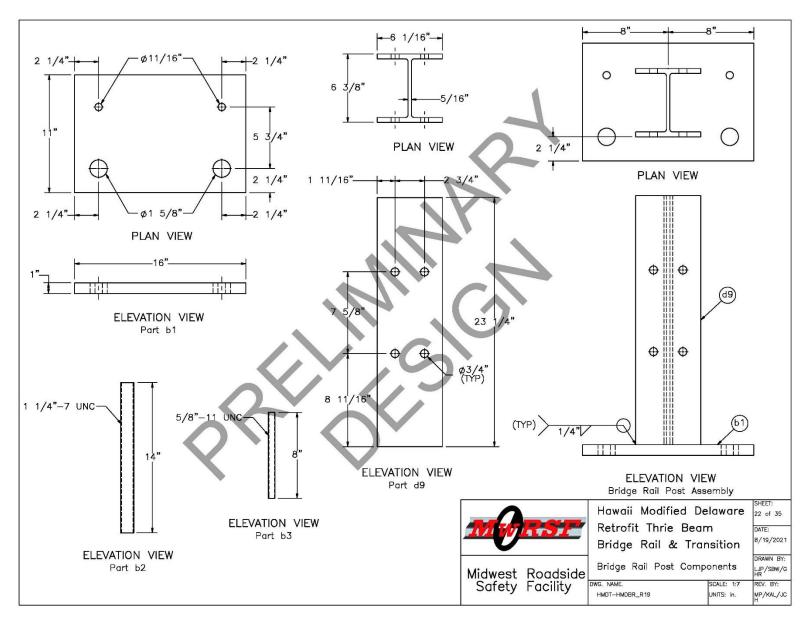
Bridge Rail Post Components, Test No. HMDT-1
